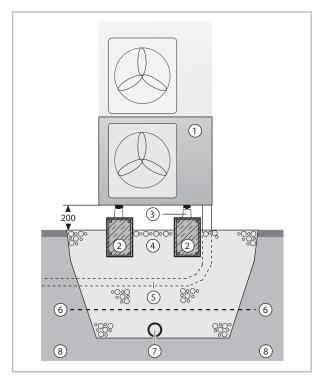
Condensate drainage, seepage of condensate and strip foundation (cross-section)
